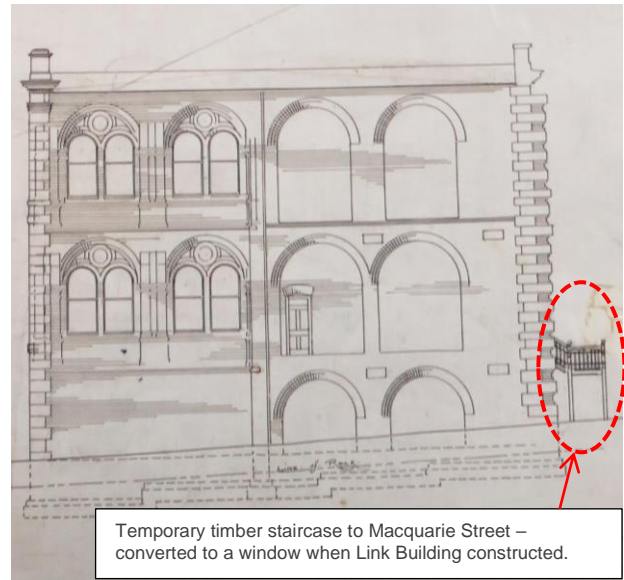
Southern (side) boundary of Strong Room (to be adjoining Link Building after Link Building constructed)
